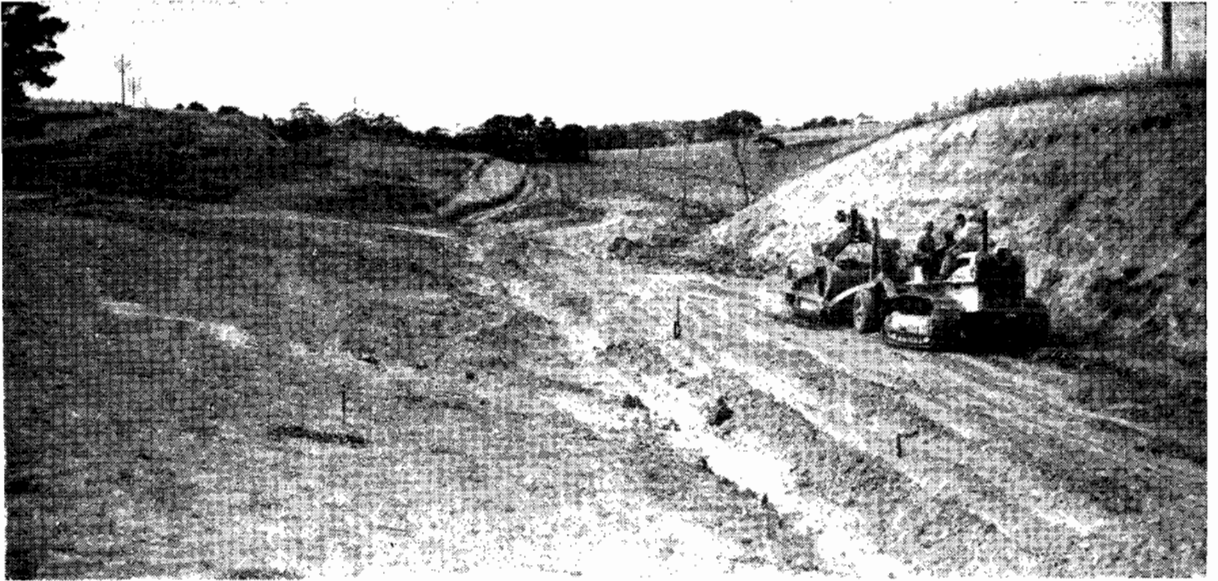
Construction of Whitelaw By-pass Road. western end.
